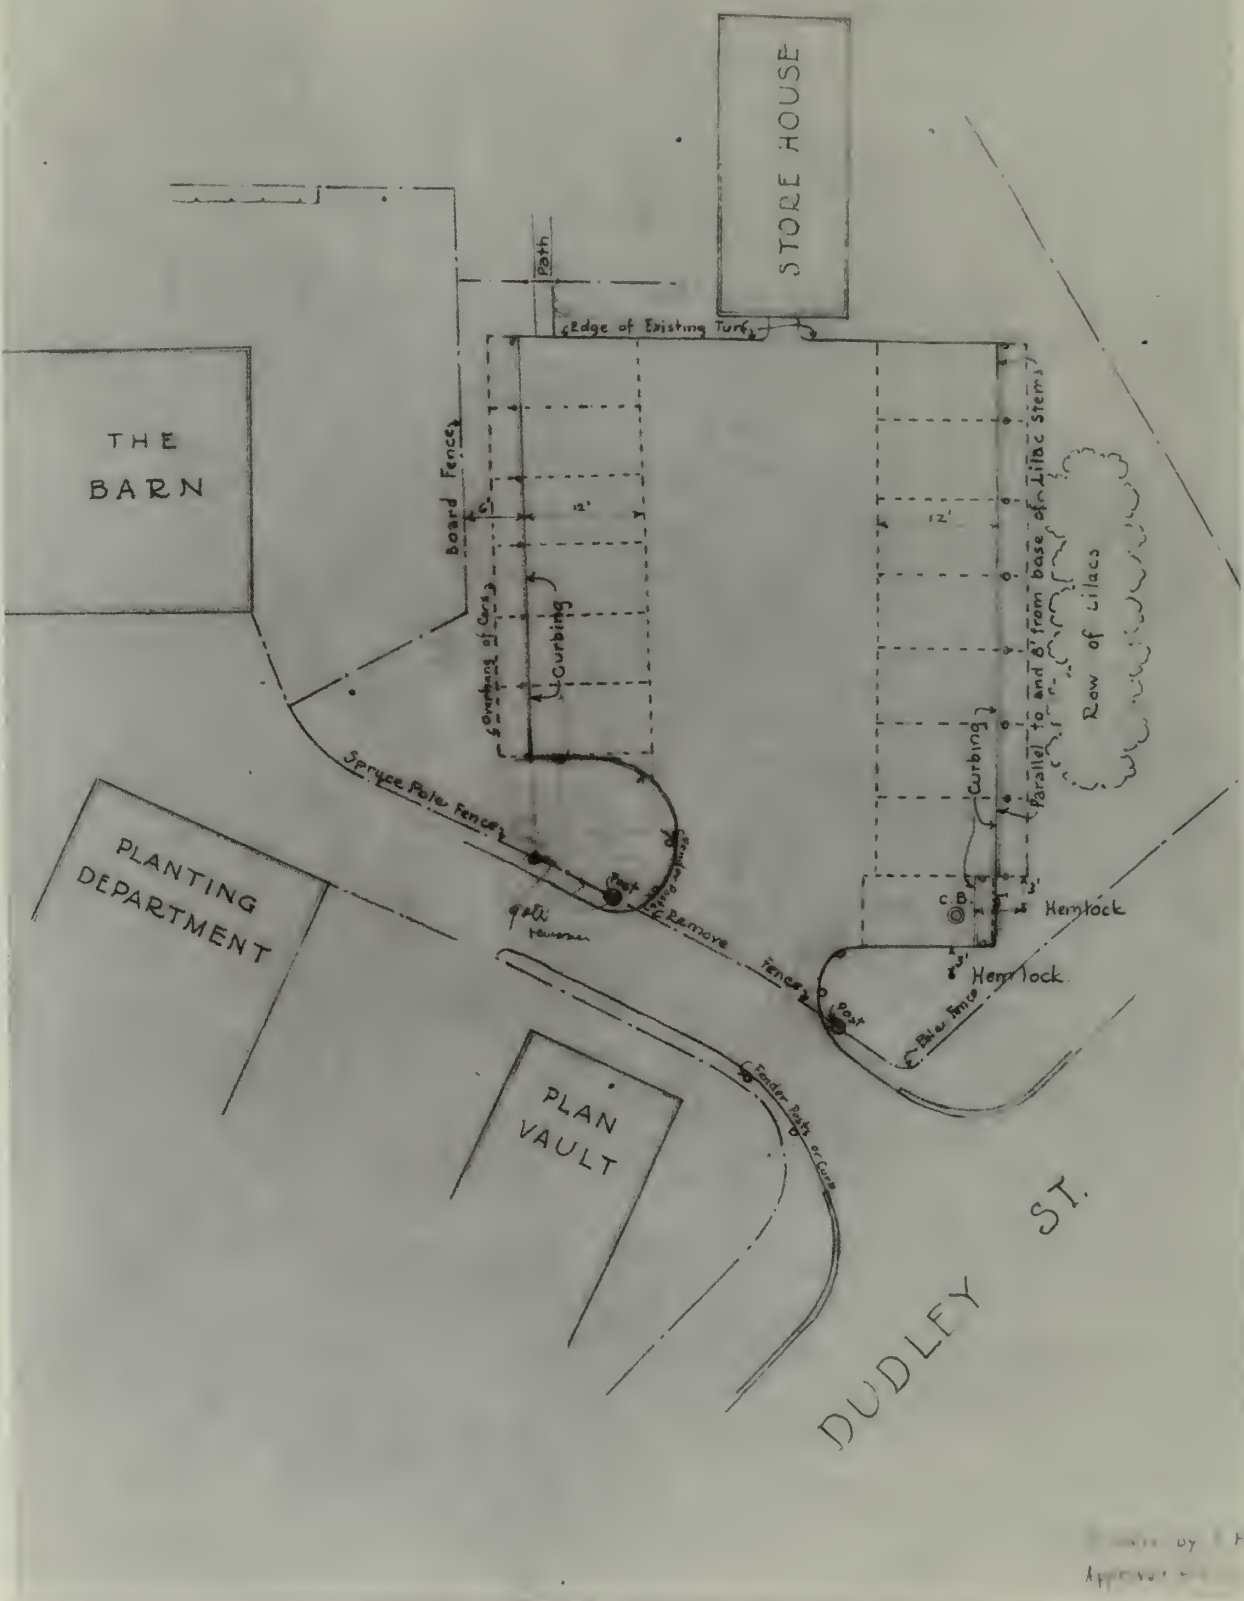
Site plan for the parking lot, showing surrounding fences, September 11, 1926.
